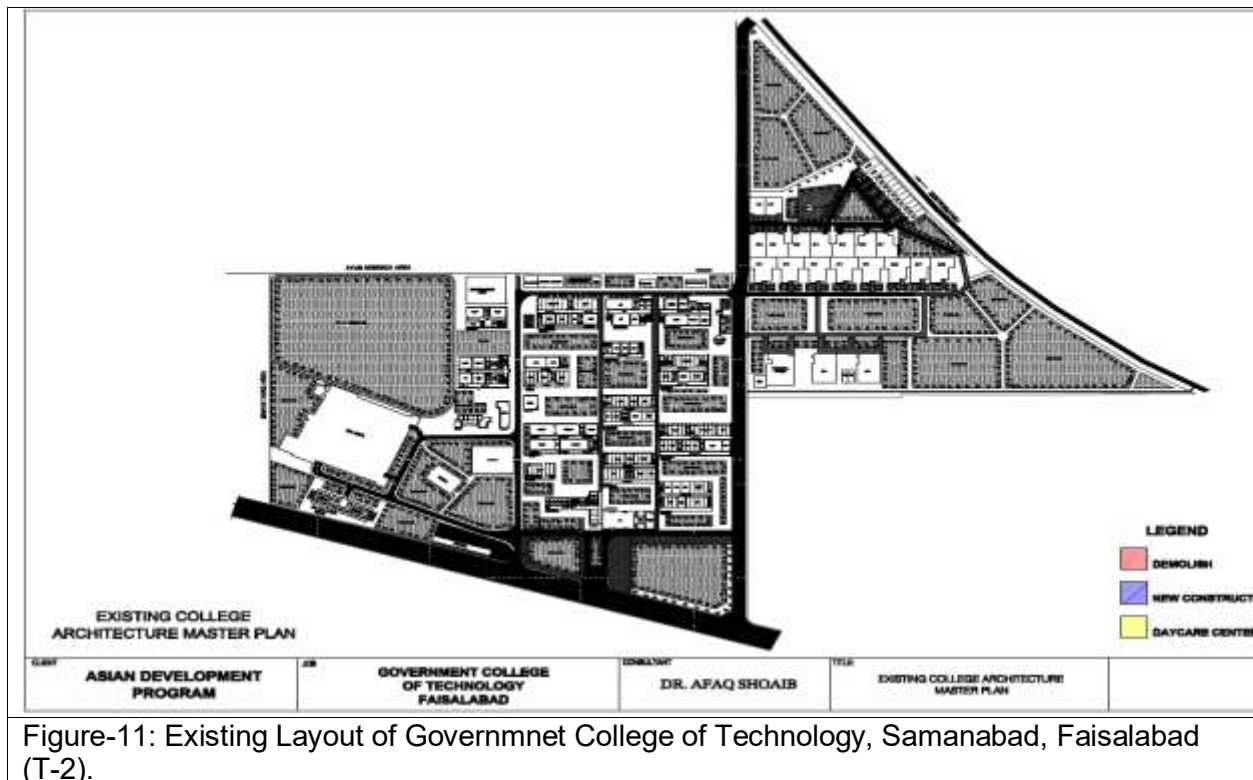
Existing Layout of Government College of Technology, Samanabad, Faisalabad (T-2).
